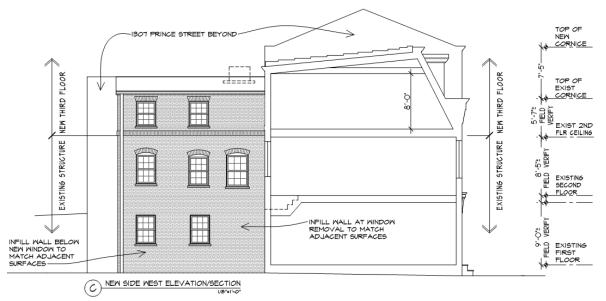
Proposed west elevation/section showing third floor addition at rear ell and set back mansard roof
